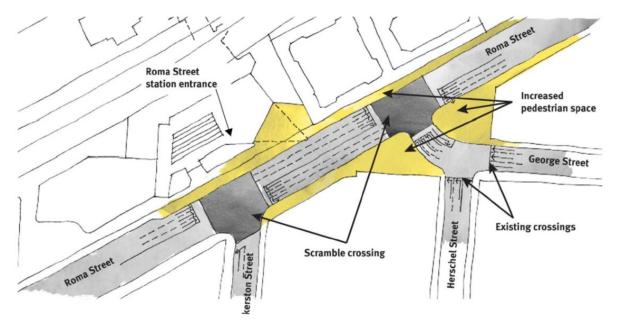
RfPC-1 Proposed Herschel Street Closure and Roma Street Intersection Layout
